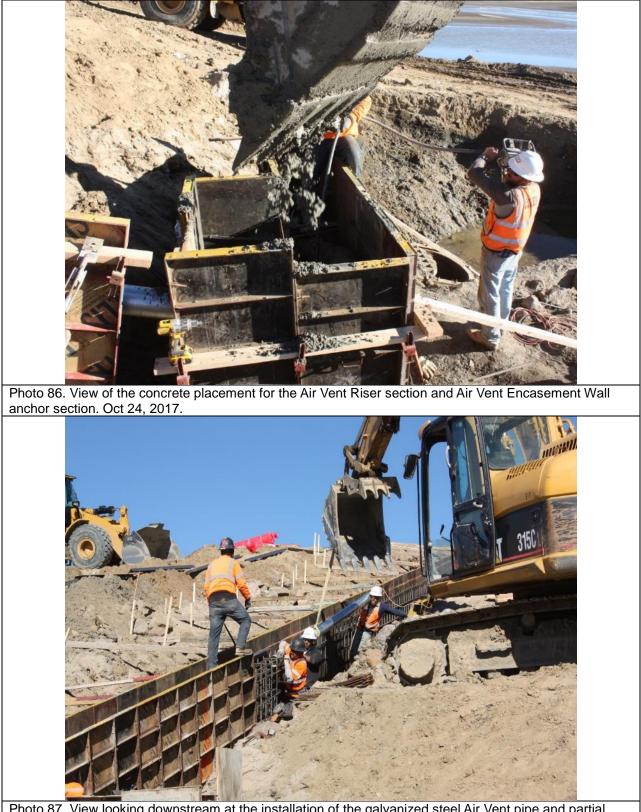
View looking downstream at the installation of the galvanized steel Air Vent pipe and partial rebar and formwork for the Air Vent Encasement Wall. Oct. 25, 2017.
